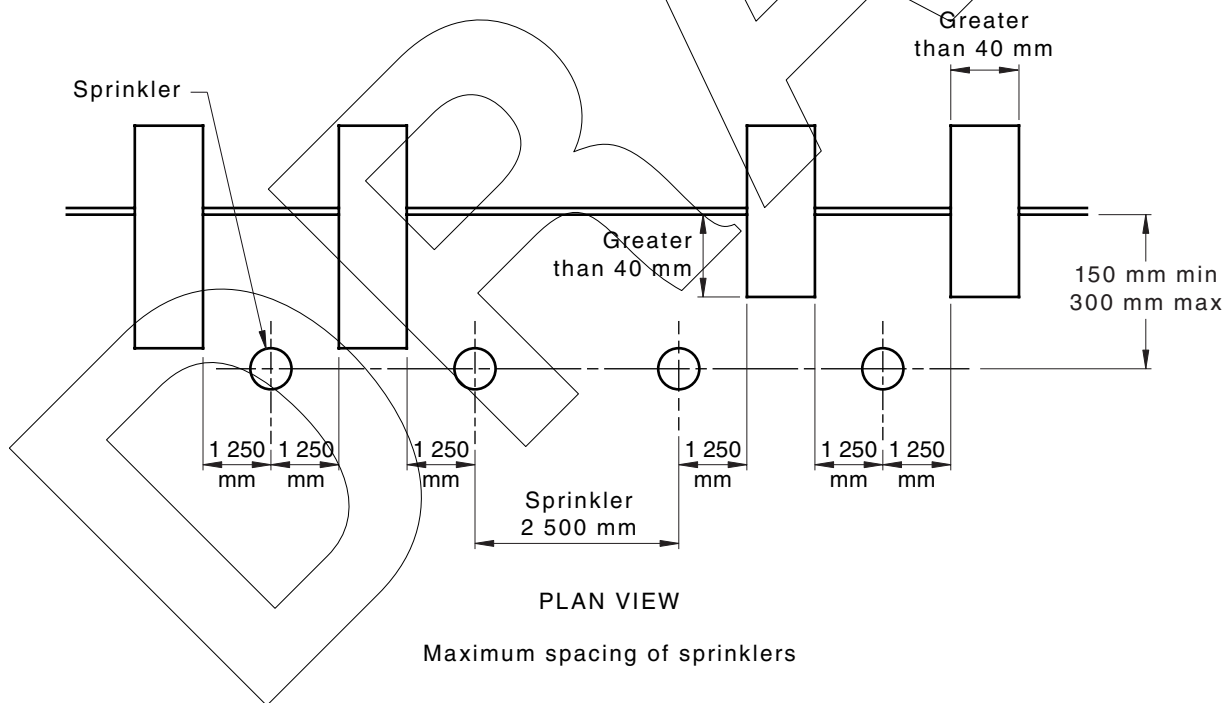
(B) — Spacing of sprinklers for opening infills having mullions more than 40 mm wide and projecting more than 40 mm from protected surface
